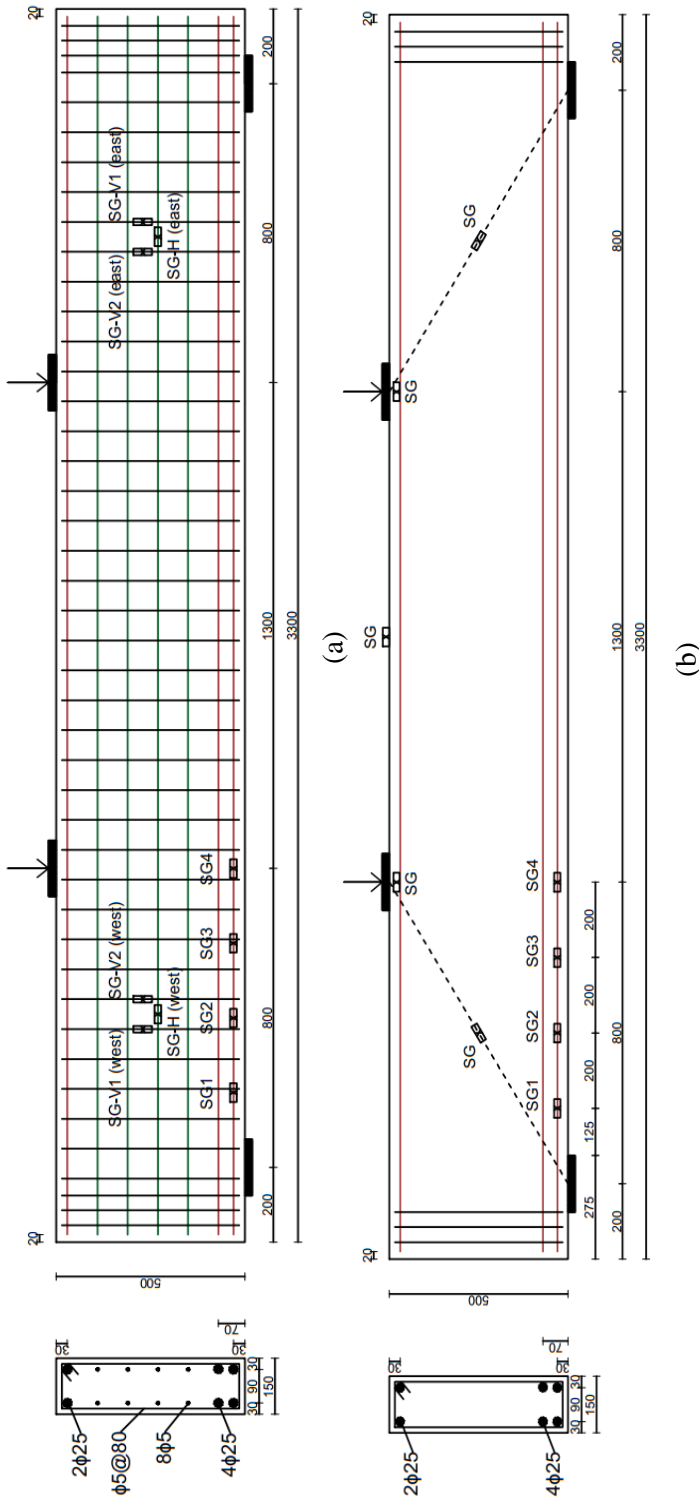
Details of deep beam specimens (dimensions are in mm): (a) A beam with traditional shear reinforcement; (b) A beam without traditional shear reinforcement
